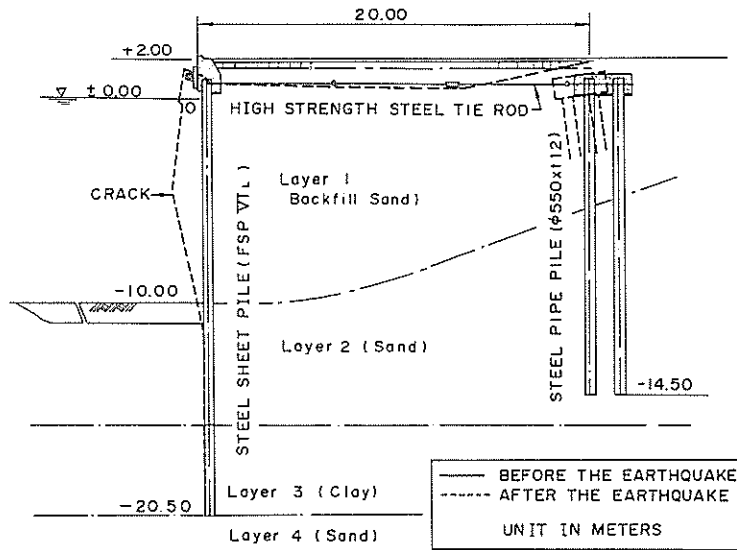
Cross section of a quay wall at Ohama No. 2 Wharf
